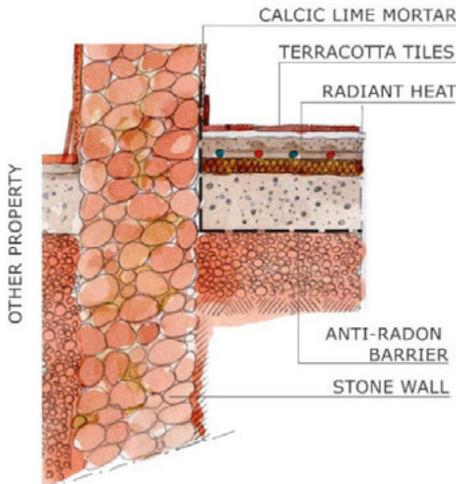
Stone walls and terracotta: detail (Li-Puma, 2021)
